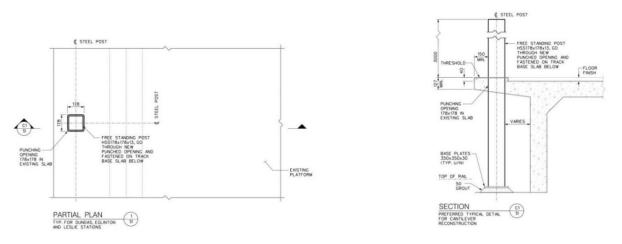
PED Structural Support on the base slab below the cantilever extending above the platform to support the doors
